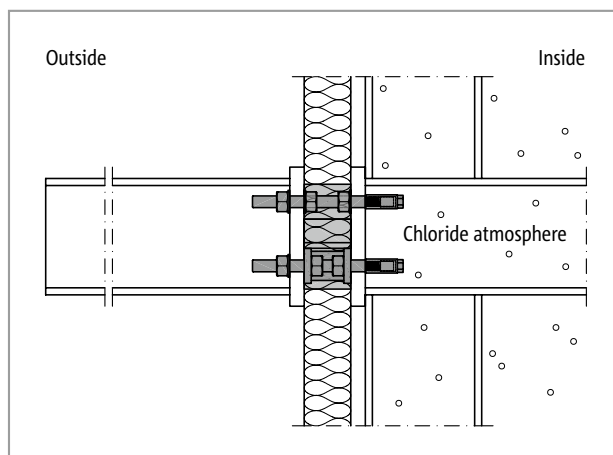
Schöck Isokorb® T type S with protective caps for cantilevered steel structure in an internal atmosphere containing chloride
